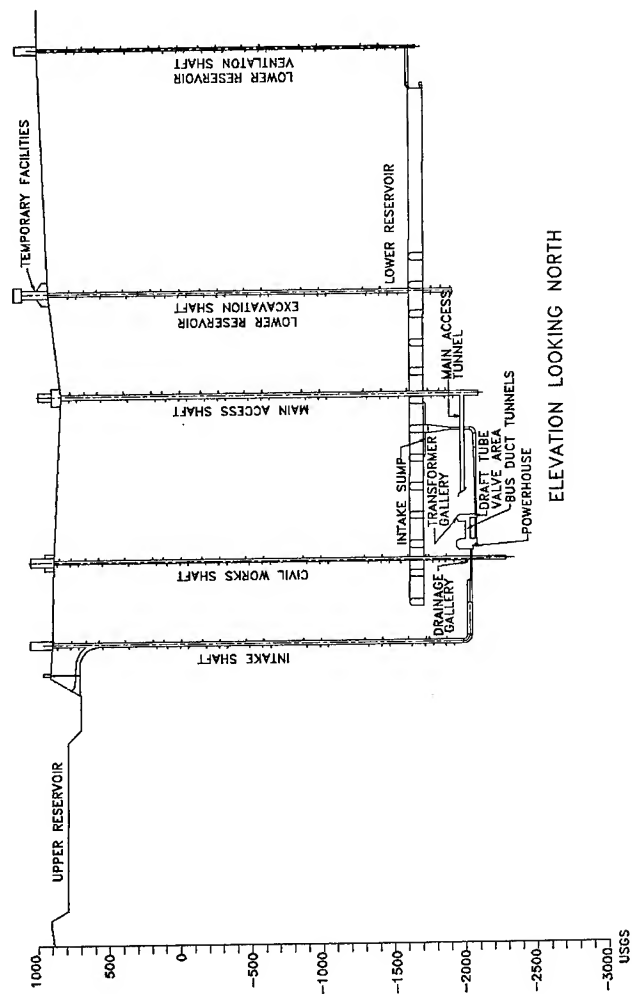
MT. HOPE WATERPOWER PROJECT - CROSS SECTION
